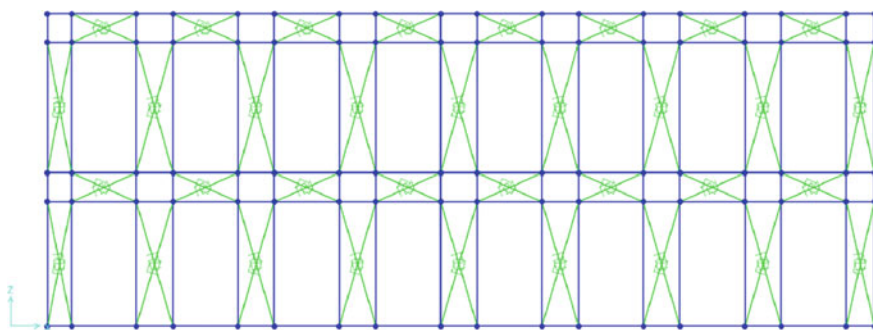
Reinforcement system FE model of the masonry wall developed by the SAP2000 software
